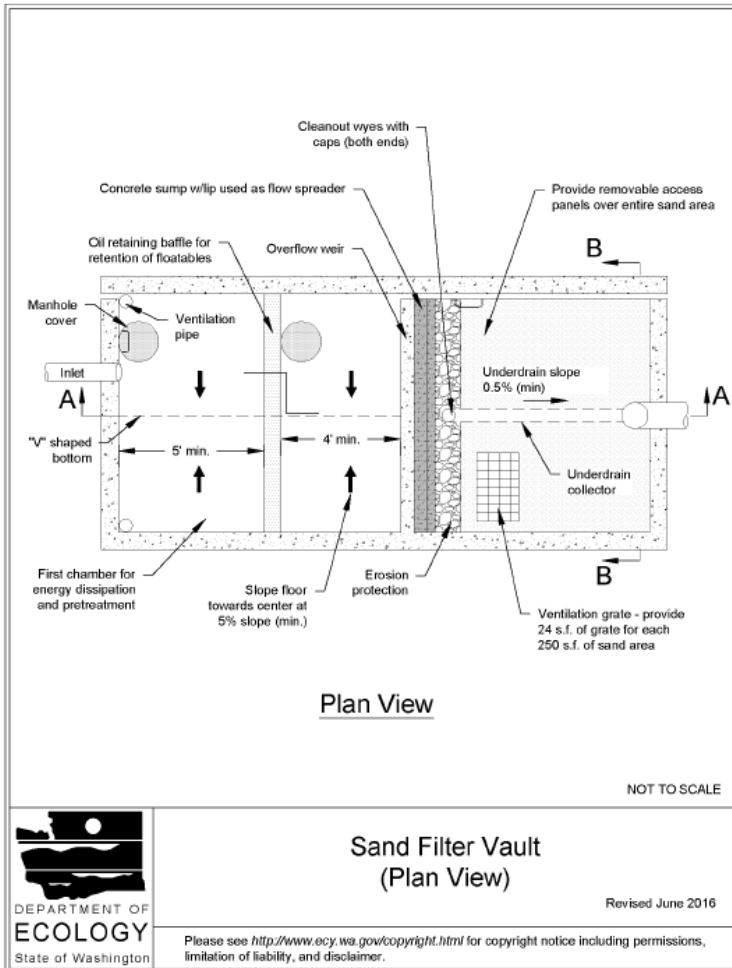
Plan view of a sand filter vault (State of Washington Department of Ecology).
